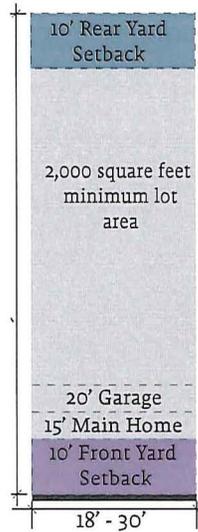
Townhouse Setback Example. See pg. 8 for specifics
